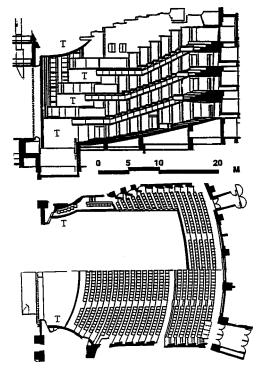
The NNT opera house as built. (Upper) Longitudinal section drawing. (Lower) Plan drawings of main floor and first balcony. The "T"'s show the trumpet reflecting surfaces.
